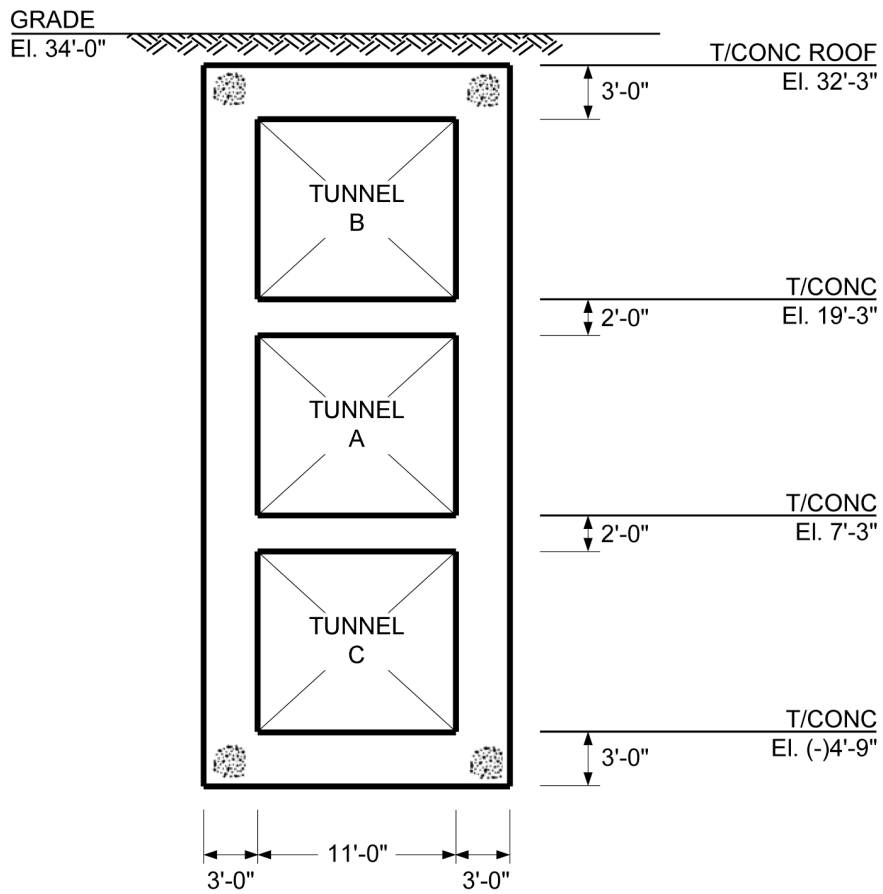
H.6-249 Typical RSW Piping Tunnel Section
